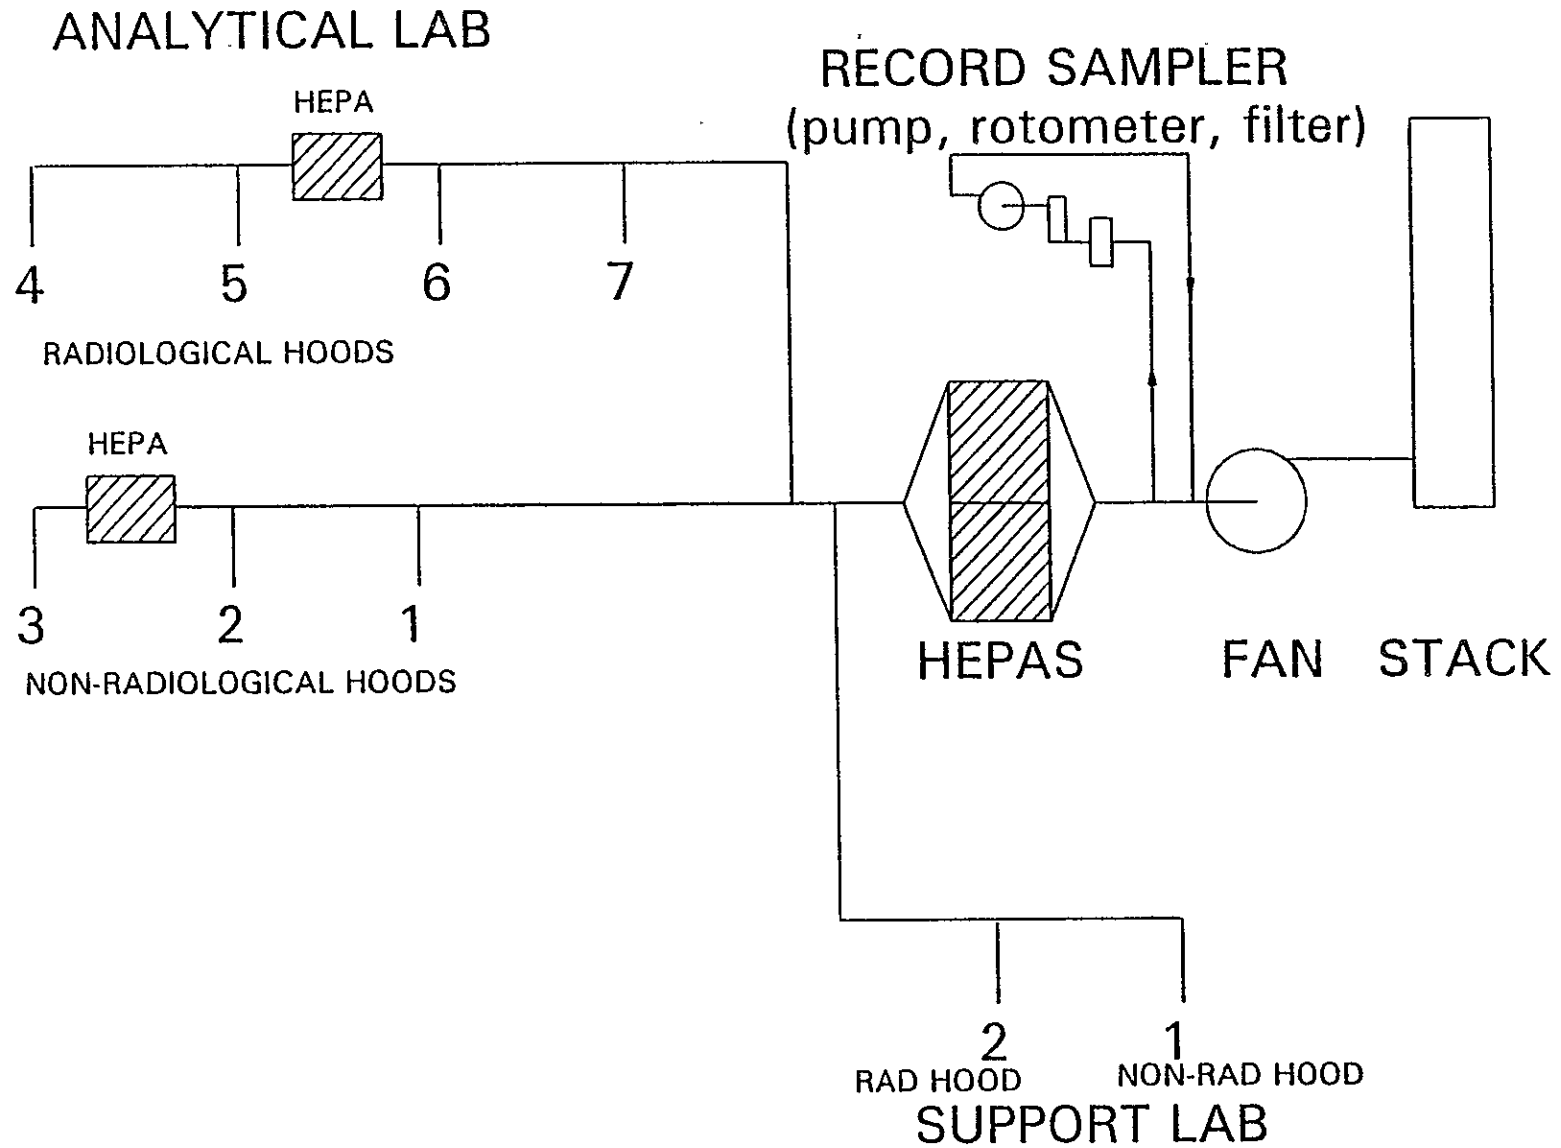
WASTEWATER PILOT PLANT LAB VENT SYSTEM
